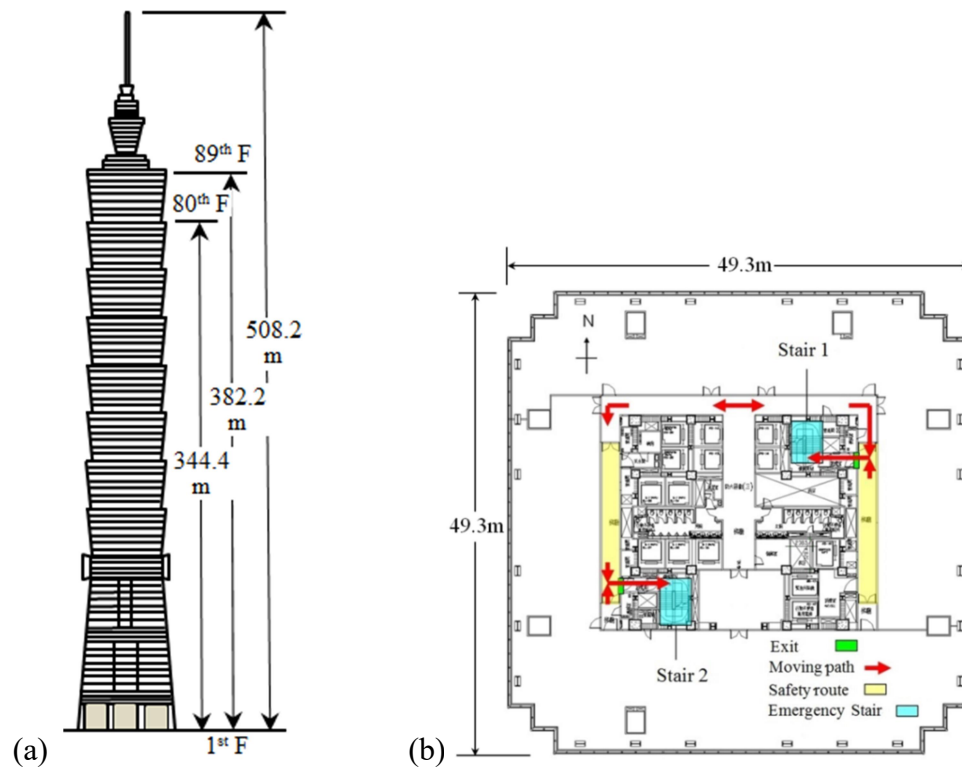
The schematic view of Taipei 101 (a); typical floor layout of evacuation strategy (b).
